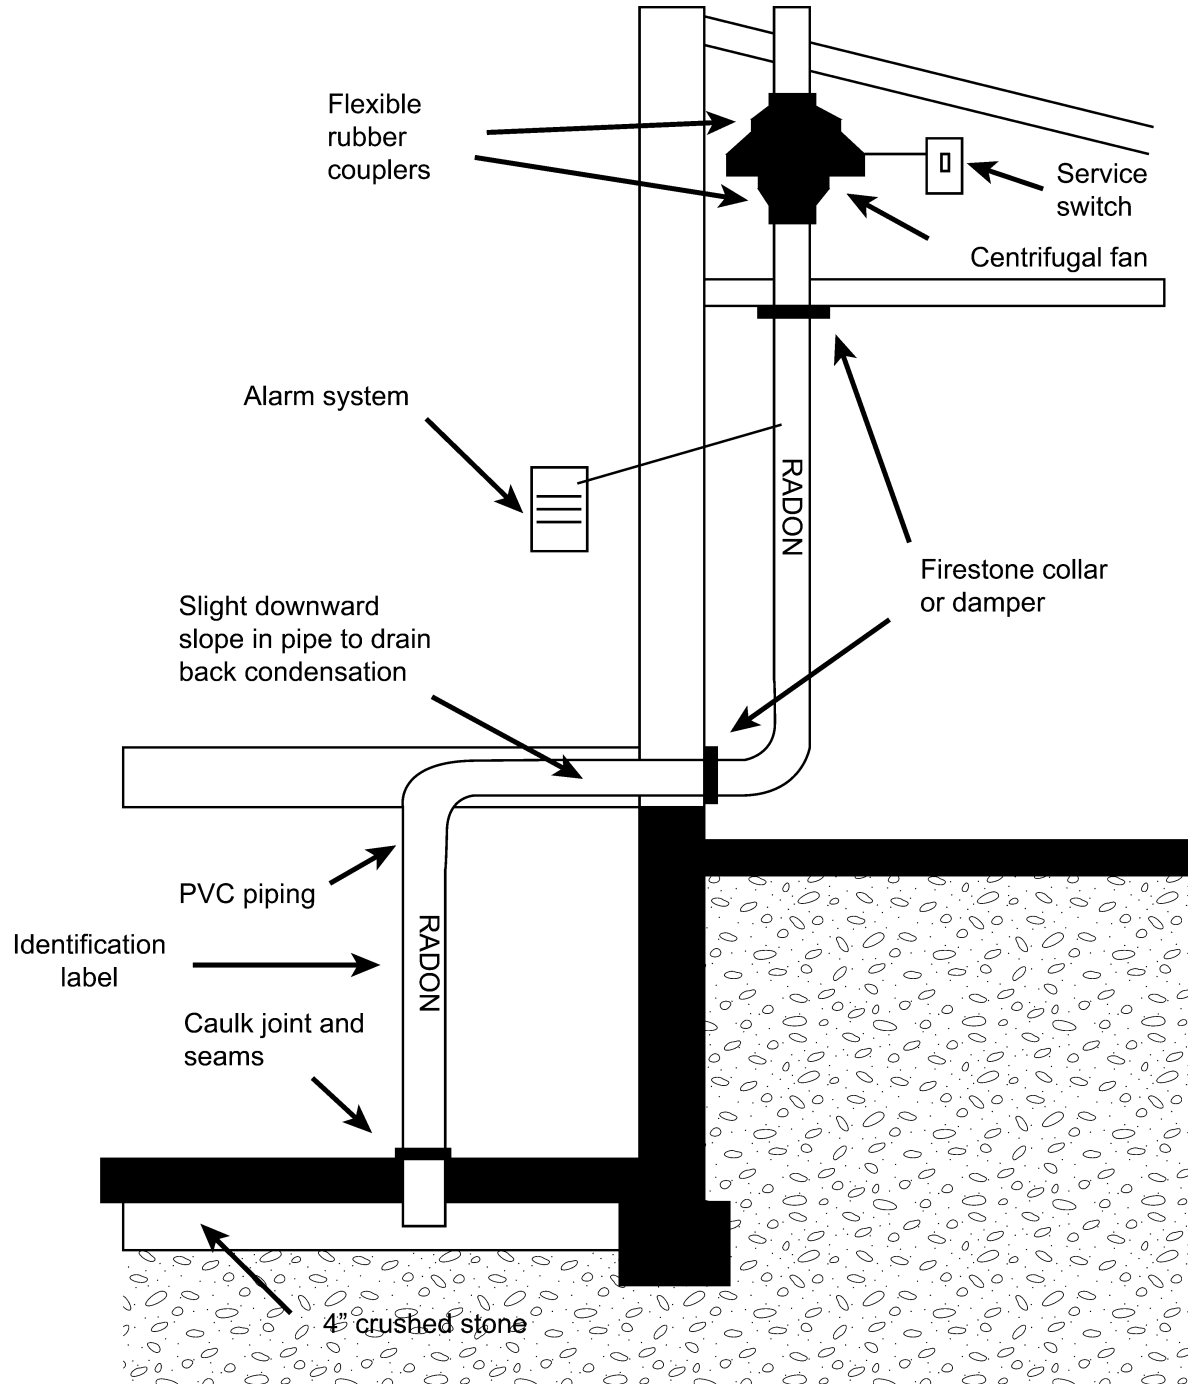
Alternative Basement to Garage Sub-Slab Depressurization Installation, Source: MURC
